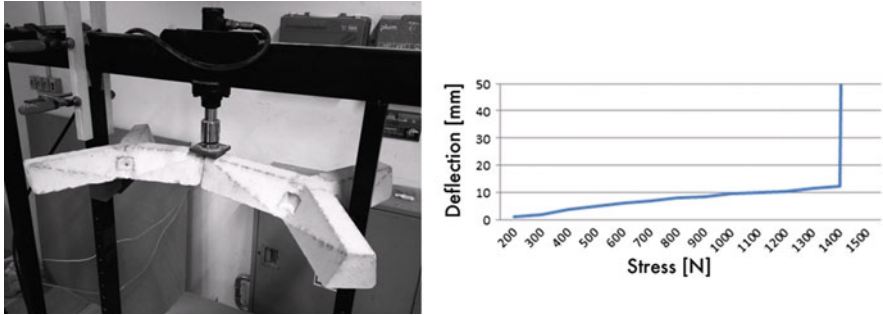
Left*: fracture test of post-tensioned concrete elements. *Right*: diagram showing 12 mm deflection before the fracture at 1,400 N
